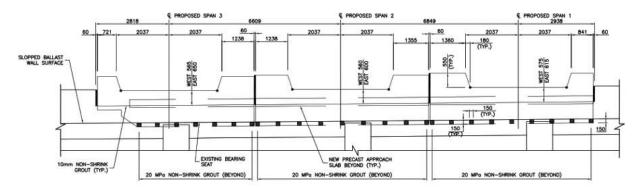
Cross section of the final bridge configuration over Lansdowne Avenue.
